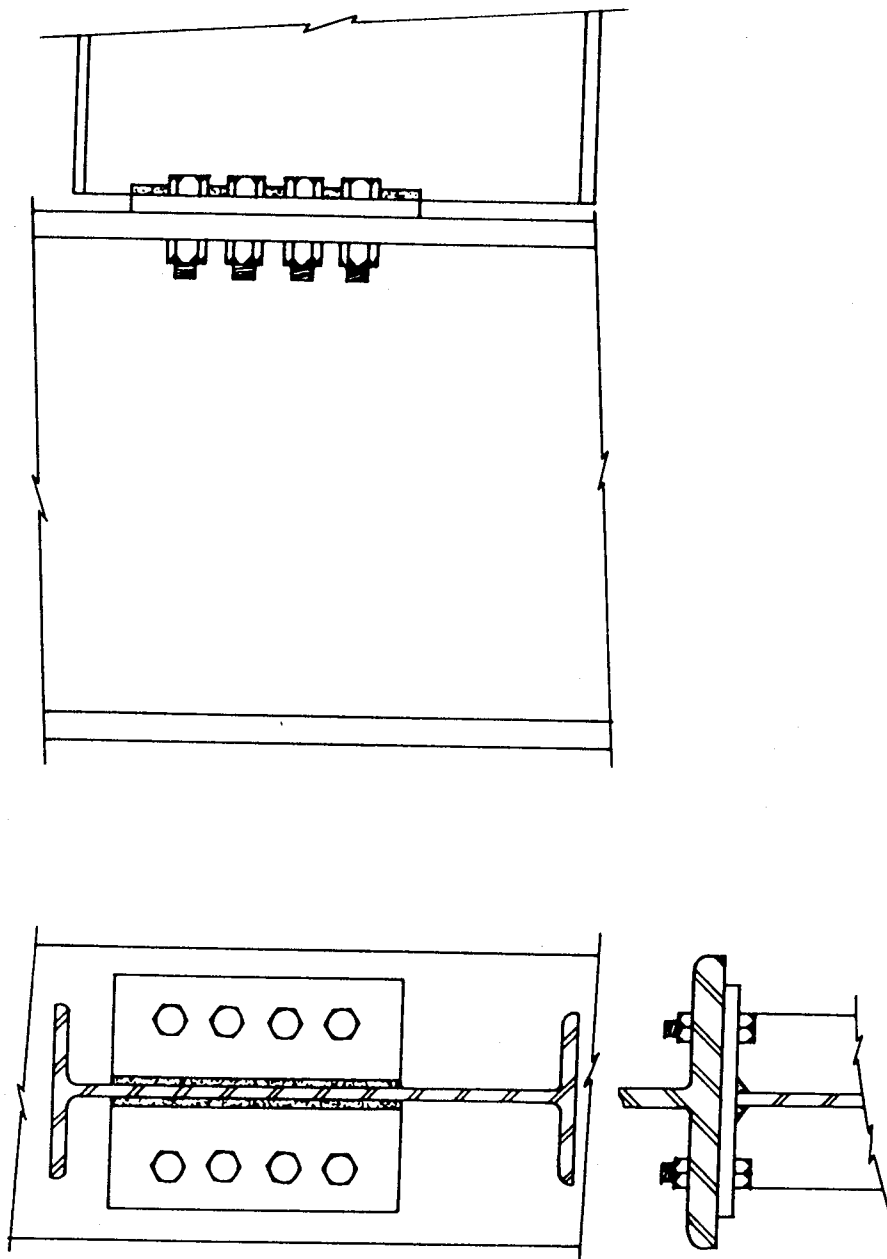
Flexible End Plate Connection to Column Flange Detail
